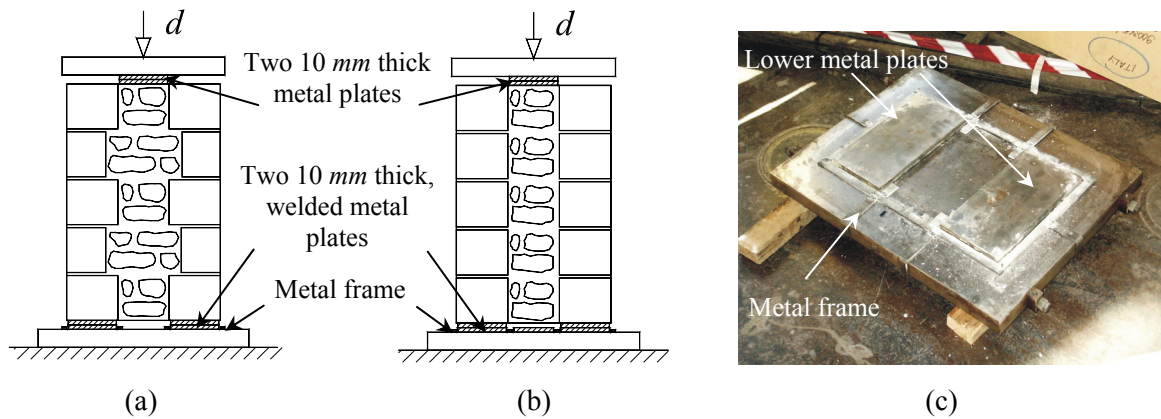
Test setup for the shear tests: (a) wallets with straight collar joints, (b) wallets with keyed collar joints and (c) metal frame used to fix the lower metal plates.
